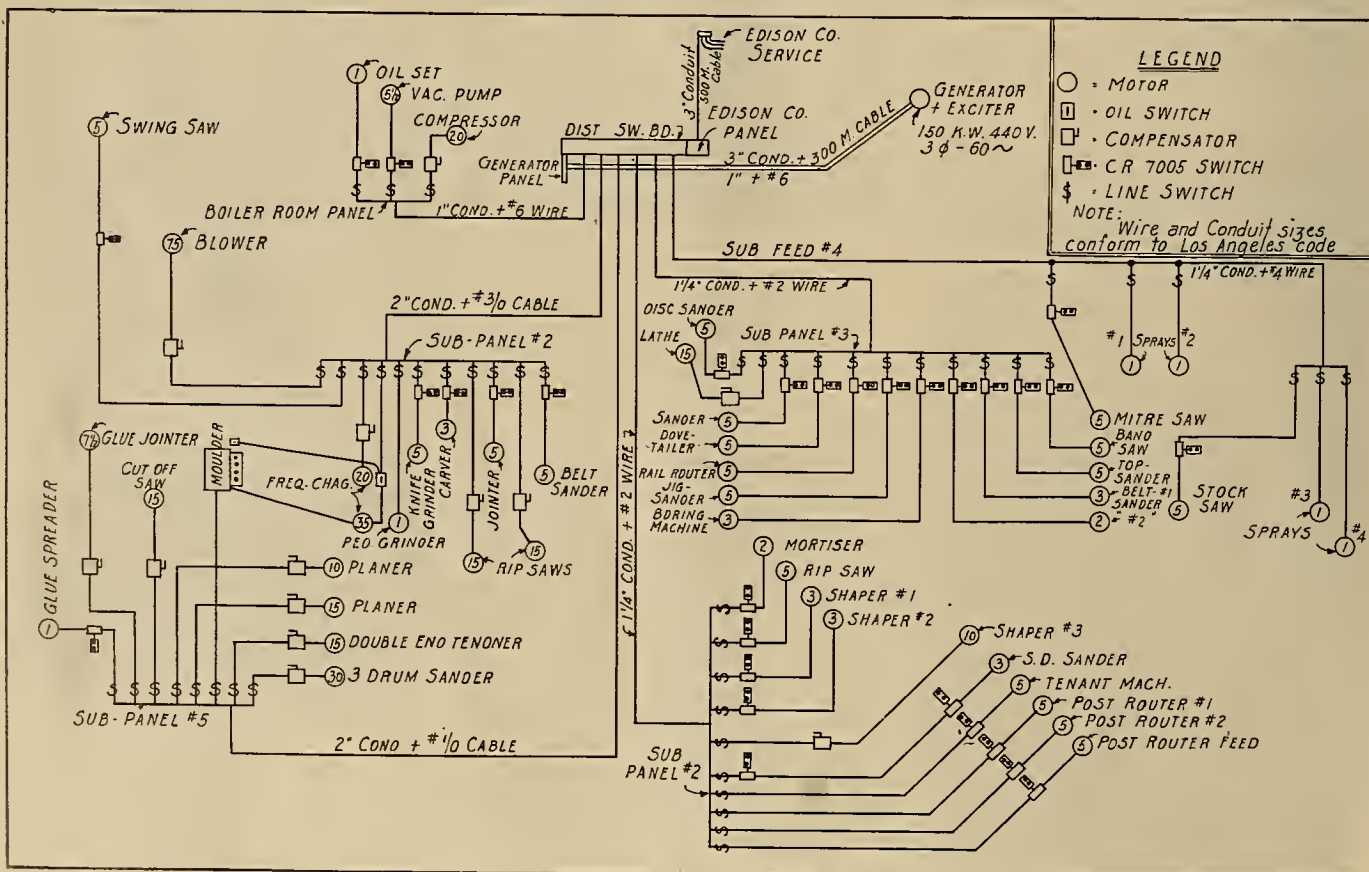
Schematic diagram of wiring layout in the plant of the White-Smith Manufacturing Company.
